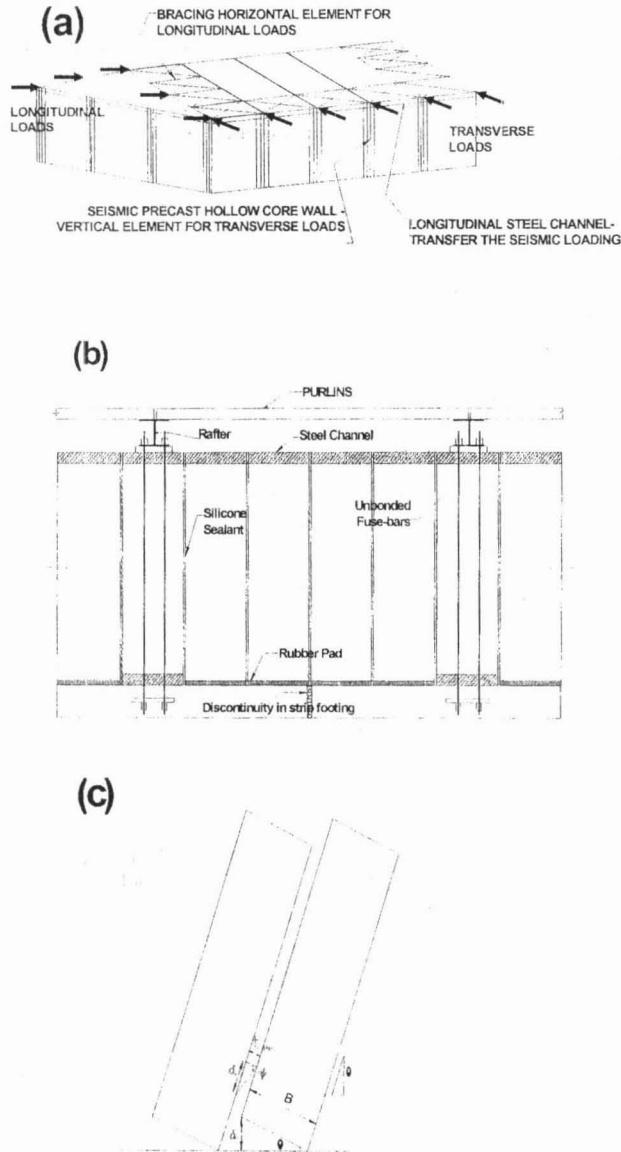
The Superassemblage Multi-Panel Wall is representing as part of a Prototype Warehouse; (a) the Isometric Warehouse showing the directions of loading and schematic arrangement of Seismic Walls; (b) Side Elevation of Multi-Panel Wall consisting of Seismic and Non-Seismic Wall; and (c) the Design Joint Width between the Gap of the Walls
